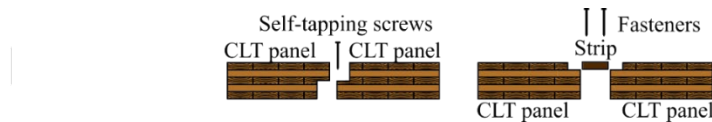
Half-lapped joint (left) and single spline (right) connections of CLT floors
